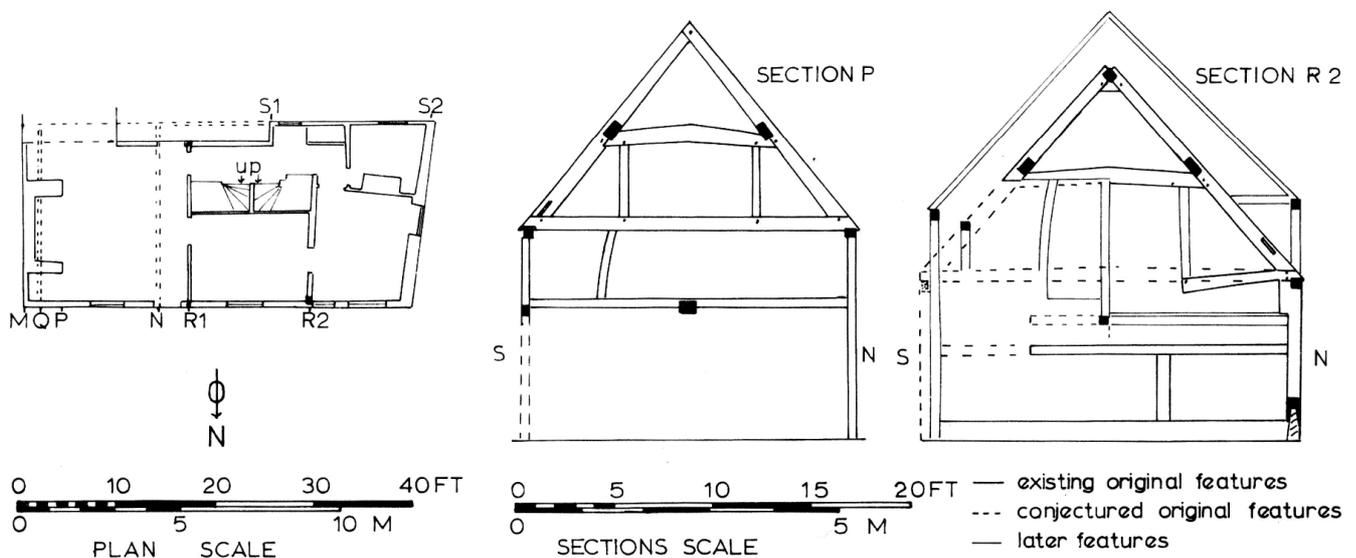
Plan and sections of 87 The Causeway (from Currie, 1976).
